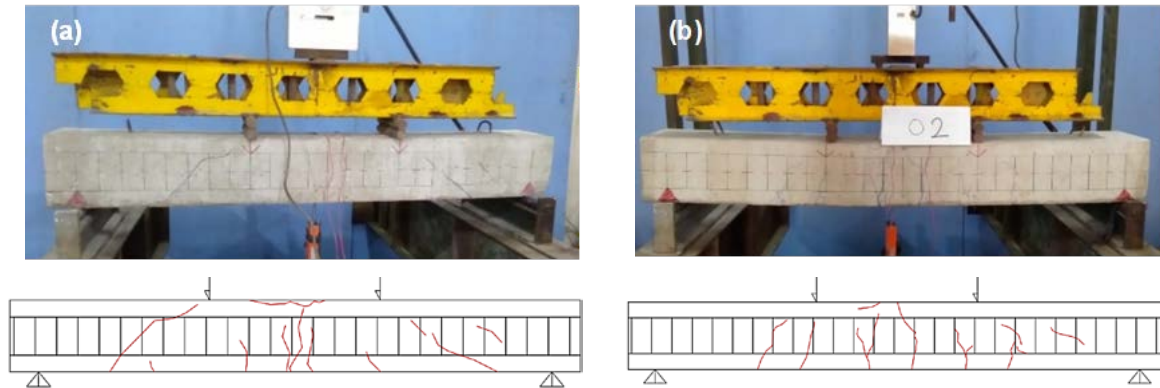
Crack pattern of Typical reinforcement system for: (a) BT-1 and (b) BT-2
